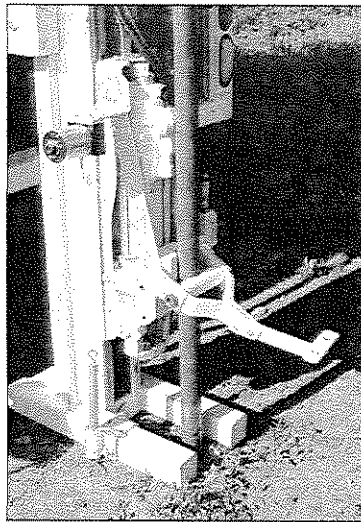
Outer casing may be retrieved with a pull cap or rod grip pull system if the probe hole is sealed with granular bentonite.
